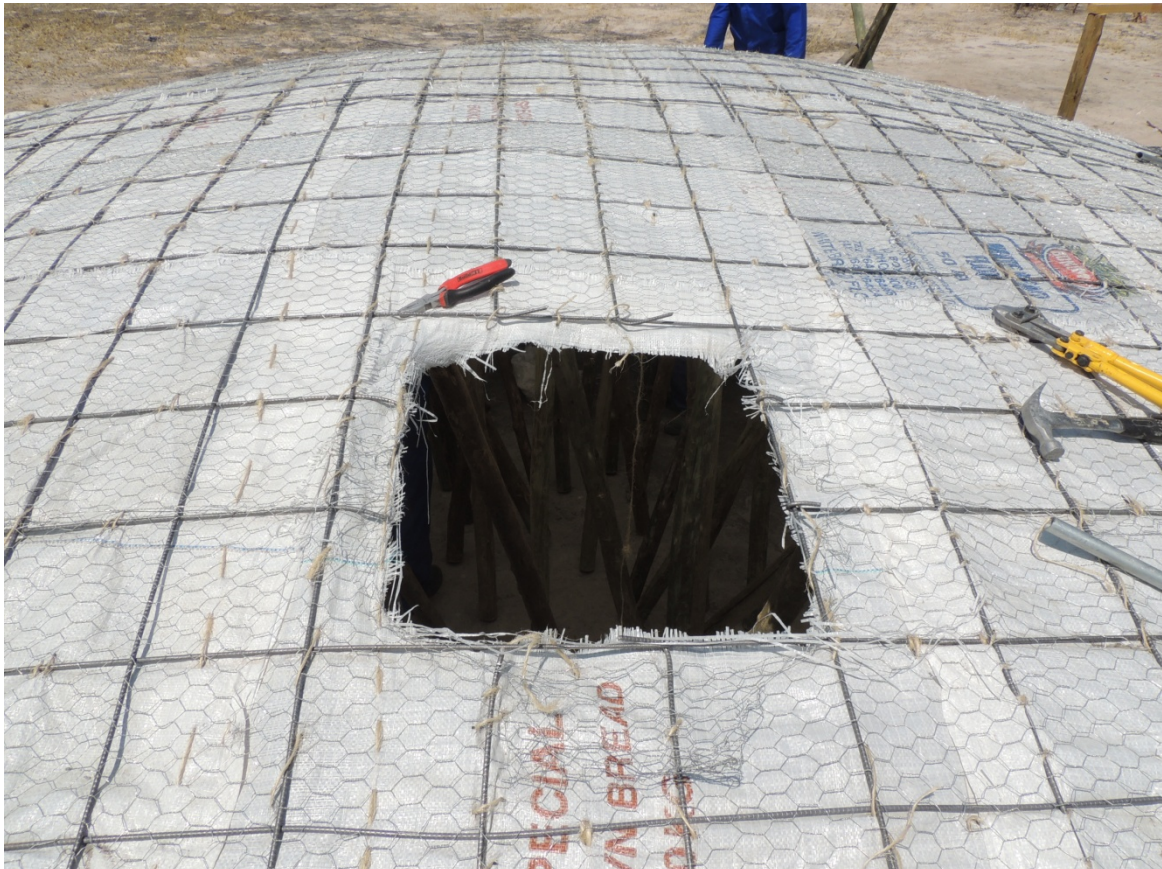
Roof with good dome shape and manhole cut into reinforcement.
